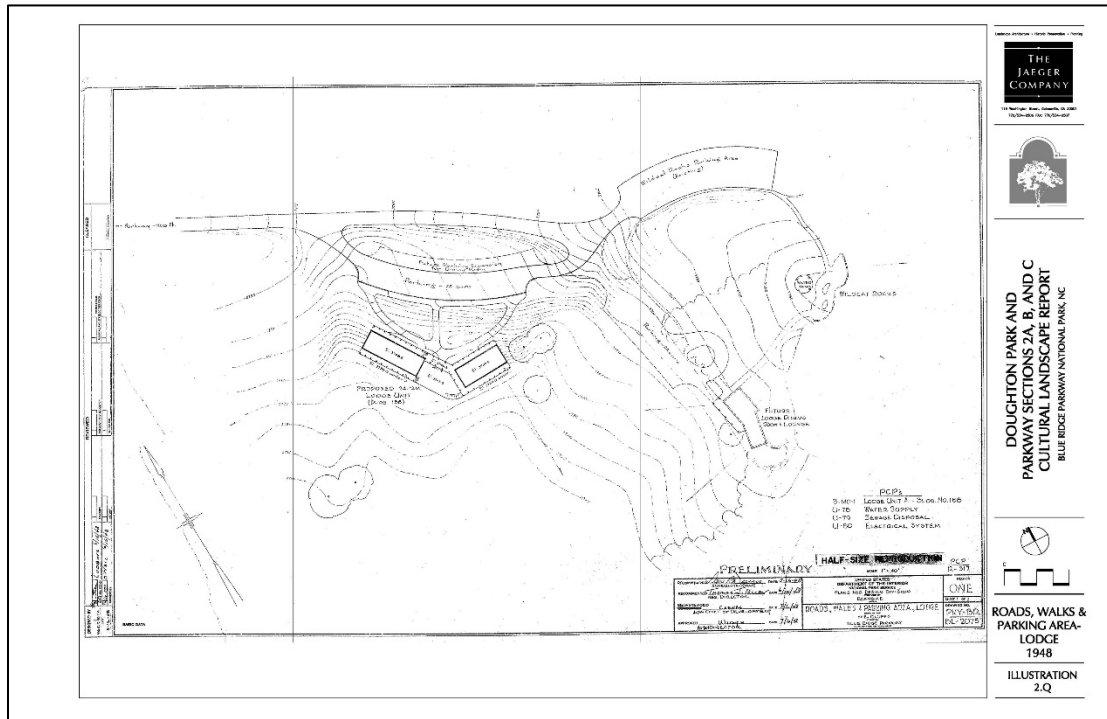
C. 1948 drawing illustrating the layout of the Bluffs Lodge complex as well as plans for expanded parking. The Jaeger Company, Doughton Park and Sections 2A, B and C Blue Ridge Parkway Cultural Landscape Report (2006), p. 204.
